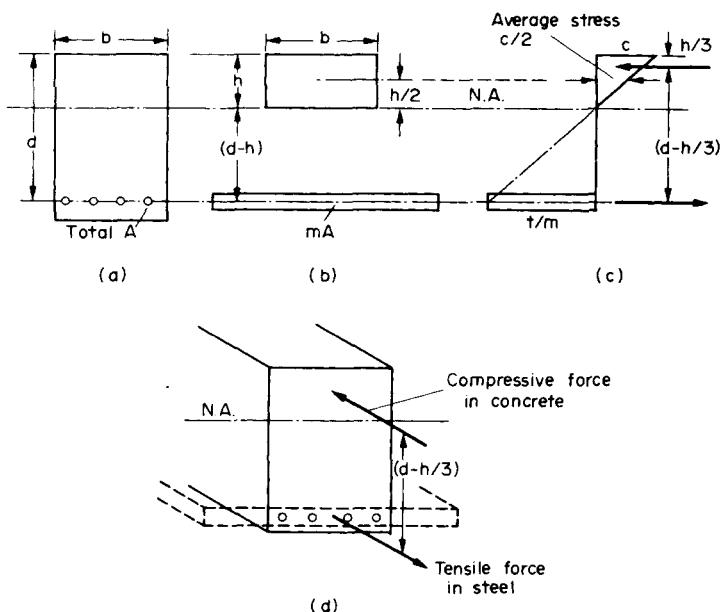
Bending of reinforced concrete beams with simple tension reinforcement.
